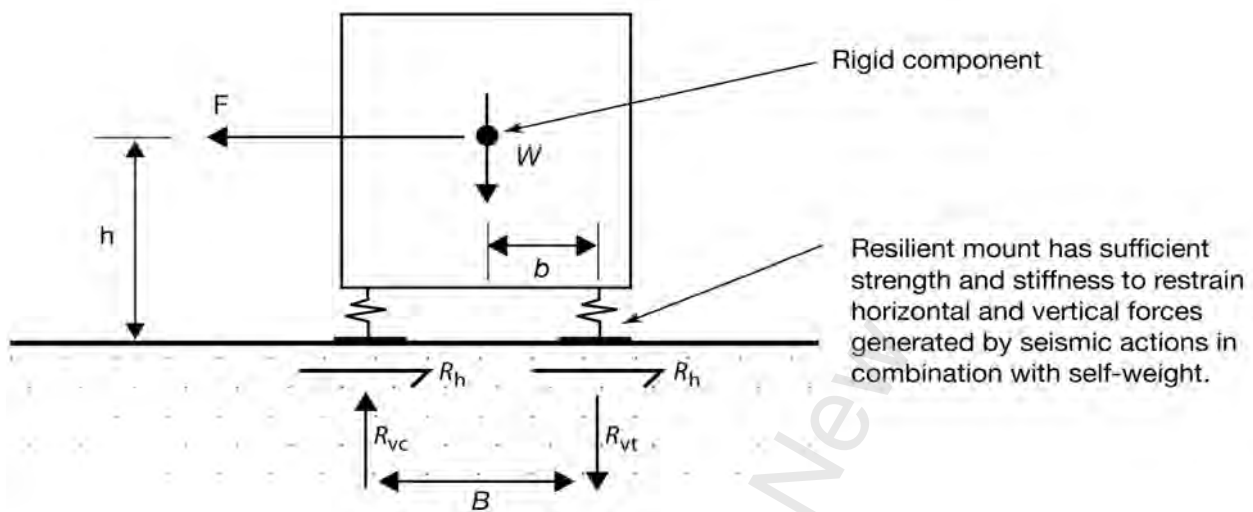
Forces on floor-mounted components using type 1 mounts without snubbers
